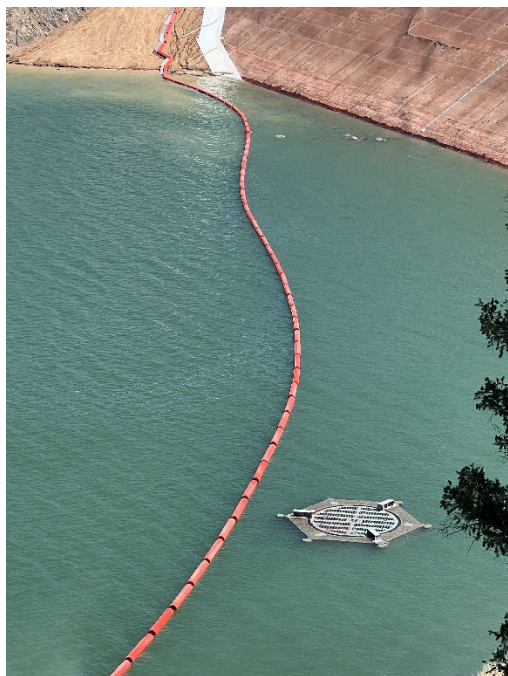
Photo of buoy installed upstream of the El Vado outlet works viewed from the right abutment (Reclamation, 2025).
